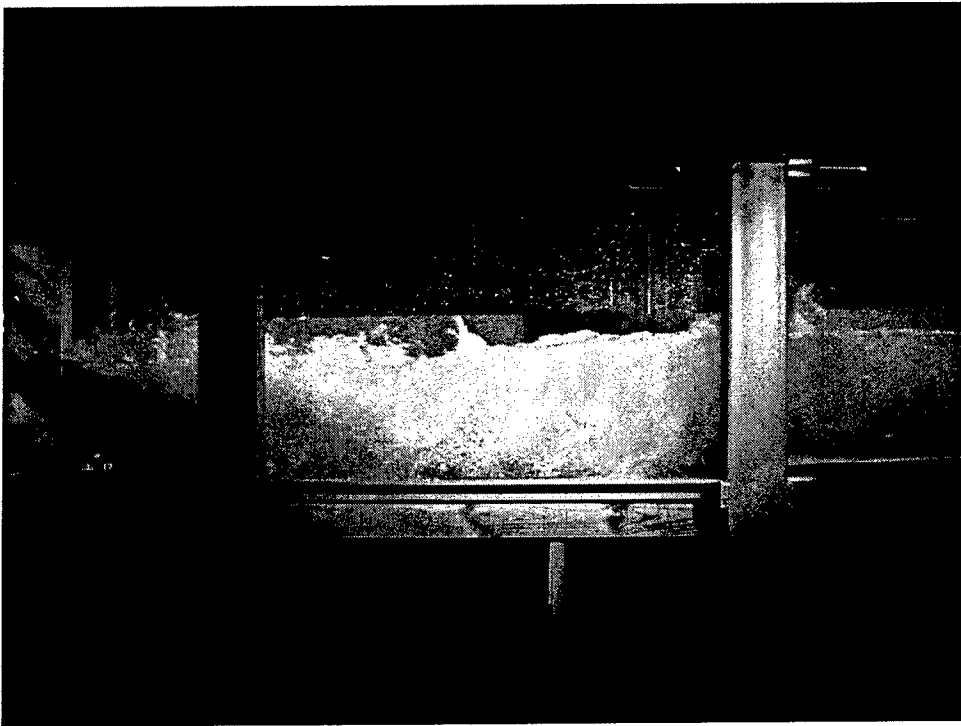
Type I deflector. Plunging jet. Gate opening – 6 ft, discharge – 10.2 kcfs/bay, pool elevation – 537, tailwater elevation – 444
